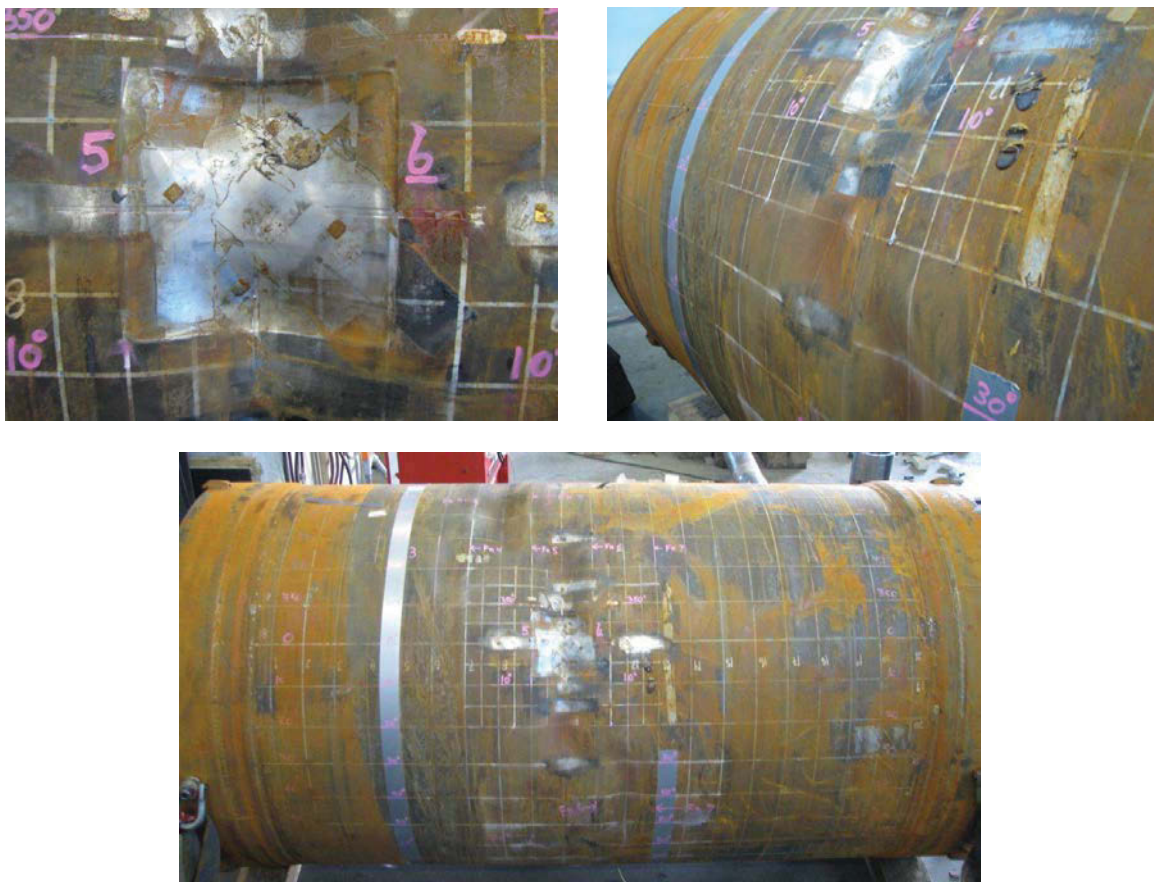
Post-collapse photos of cylinder Specimen B – Damaged.
